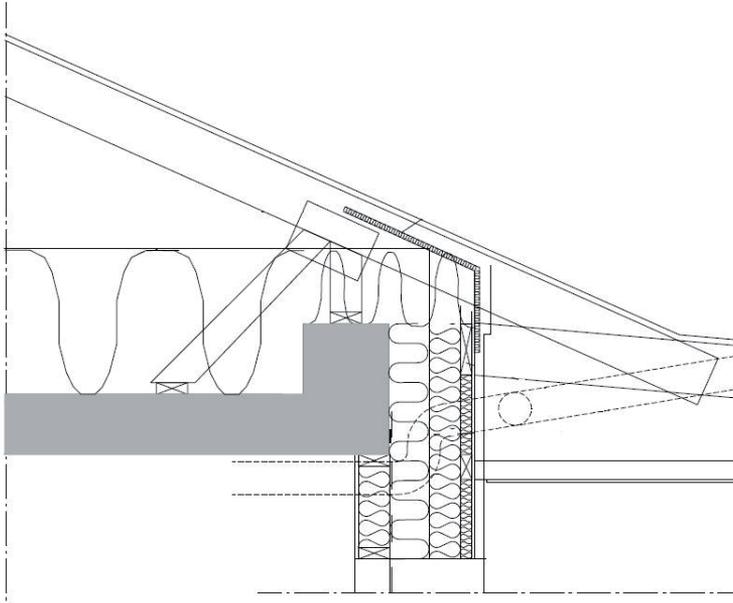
Roof in building with two storeys (Drawing: bsv arkitekter).
